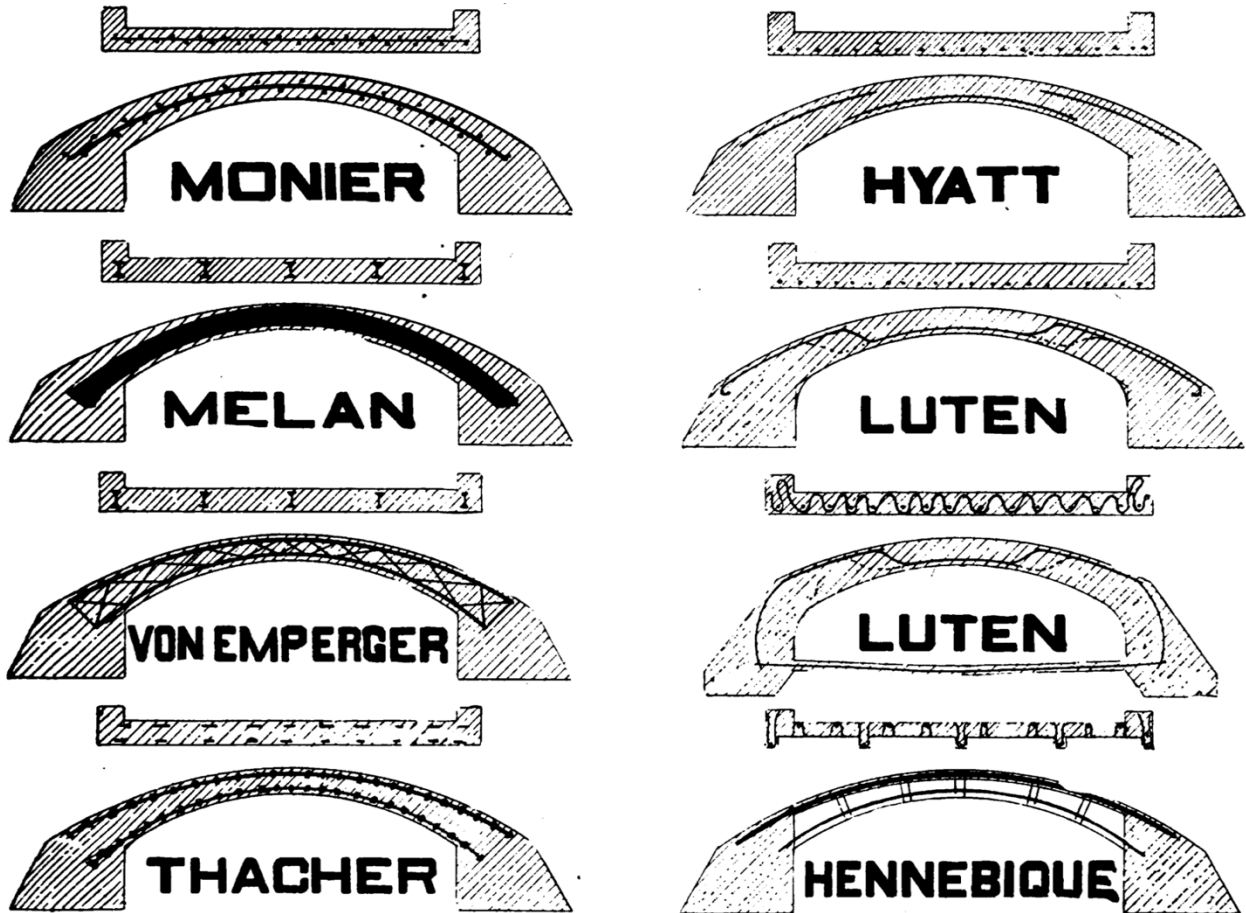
Examples of early arch reinforcement systems. Source: Daniel Luten, “Concrete-Steel Arch Bridges,” page 113.
